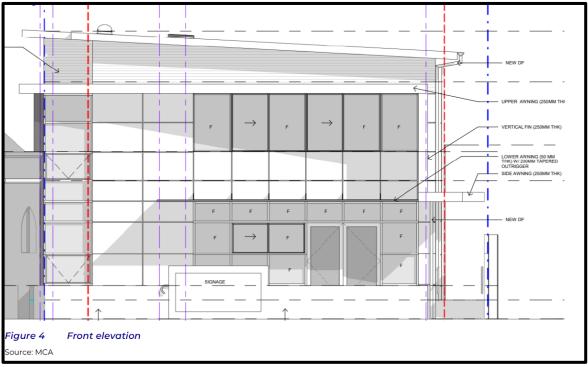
Figure 4 Referenced in Applicants Clause 4.6 Variation Request – Front Elevation (Source: Architectural Plans).
